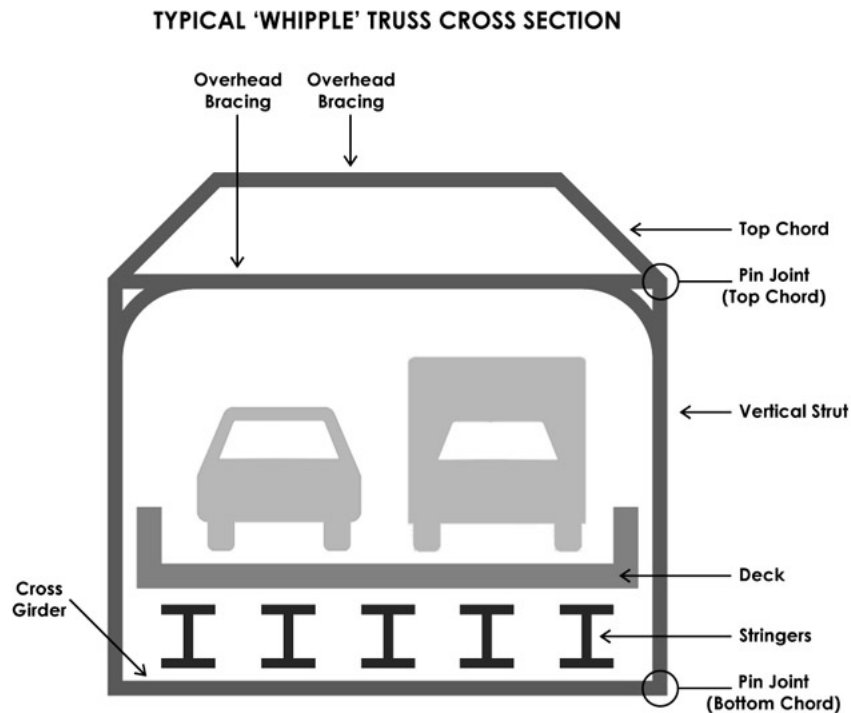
Typical cross section for a 'Whipple' Truss arrangement
